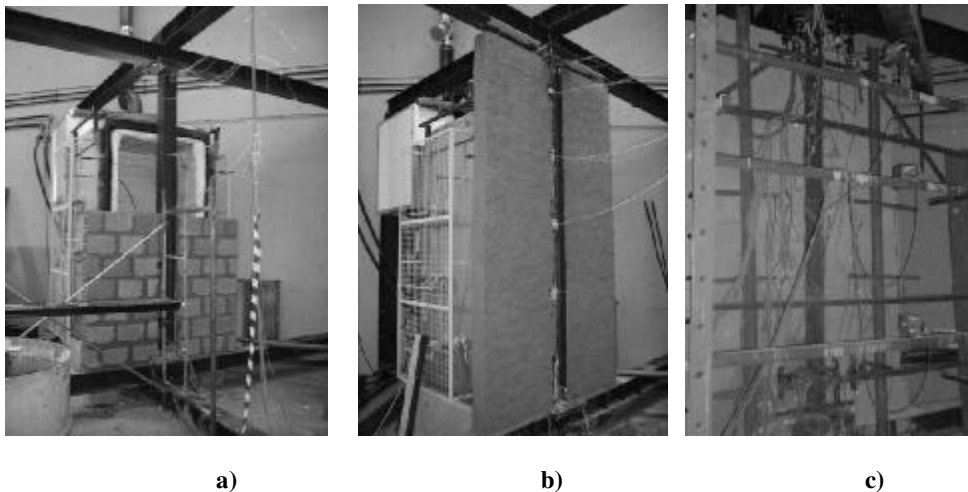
a) Construction of the test model, b) Column embedded on the wall, c) Instrumentation of the specimen.
